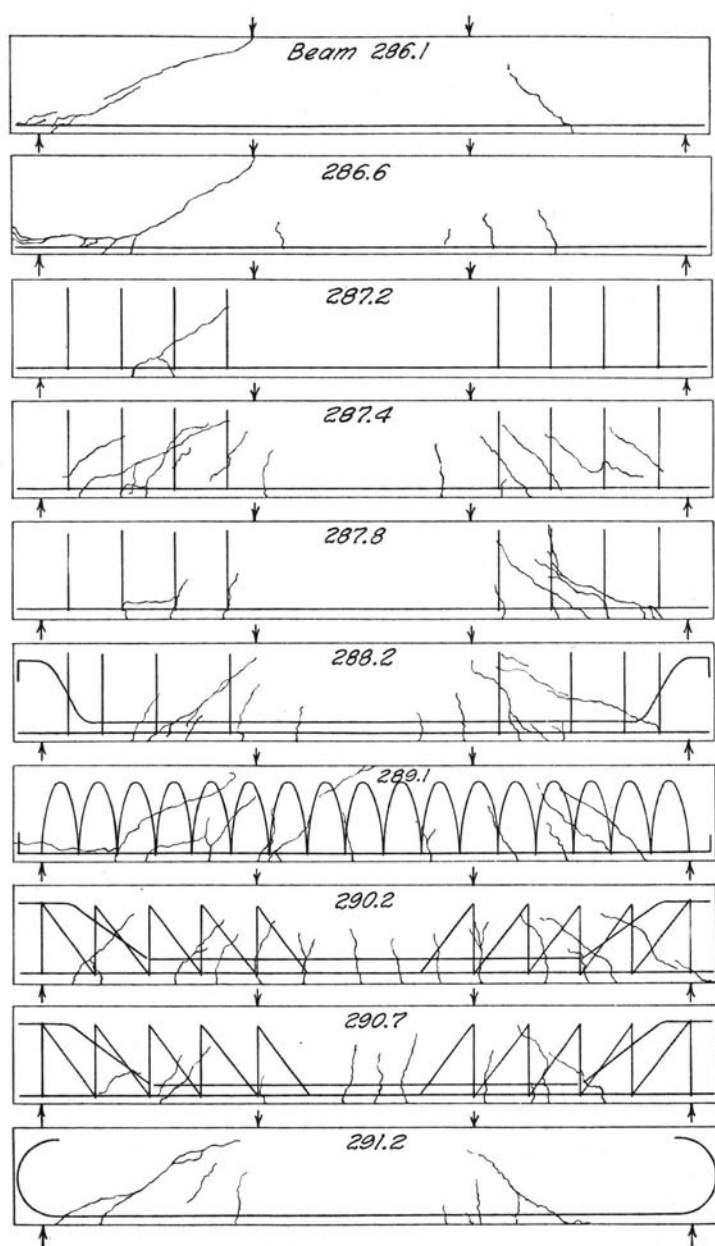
SKETCHES OF TYPICAL BEAMS AFTER FAILURE, SERIES OF 1911
